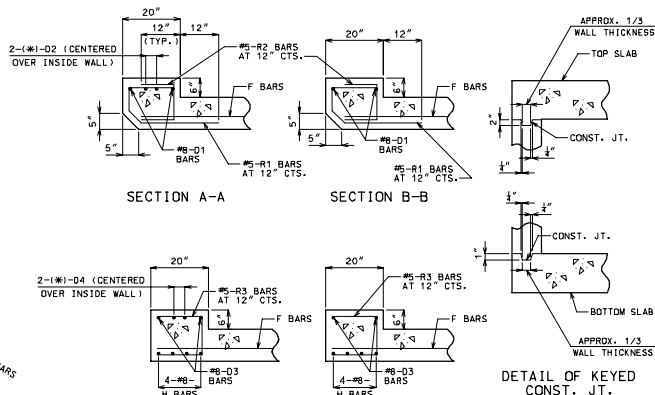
DETAIL OF TRANSVERSE JOINT THRU BARREL OF CULVERT
